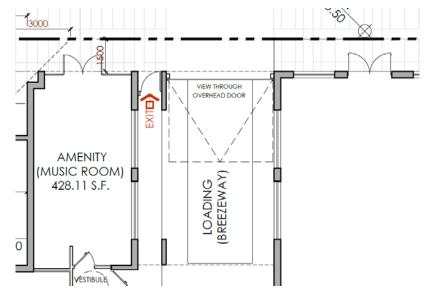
Drawing A2-04 Level 1 – Loading Area (Breezeway) detail
